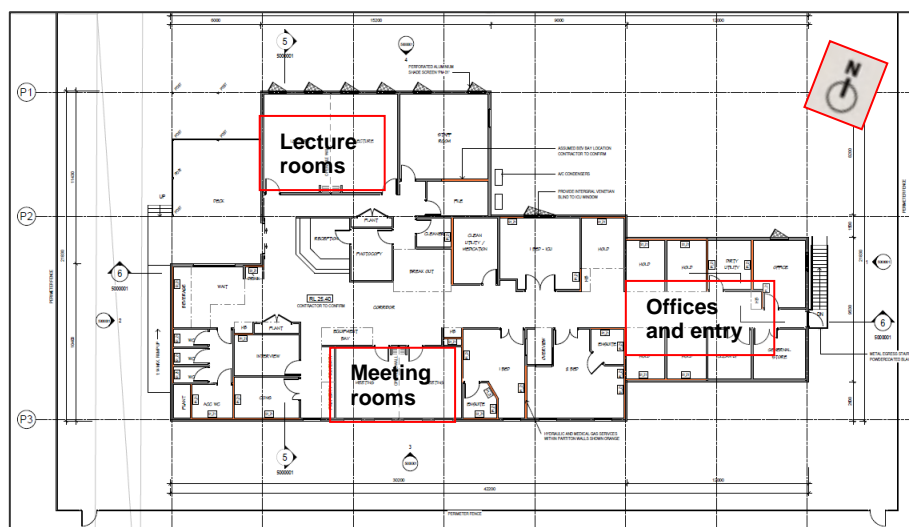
| Floor plan of Skills Centre (Source: Applicant's RTS)
